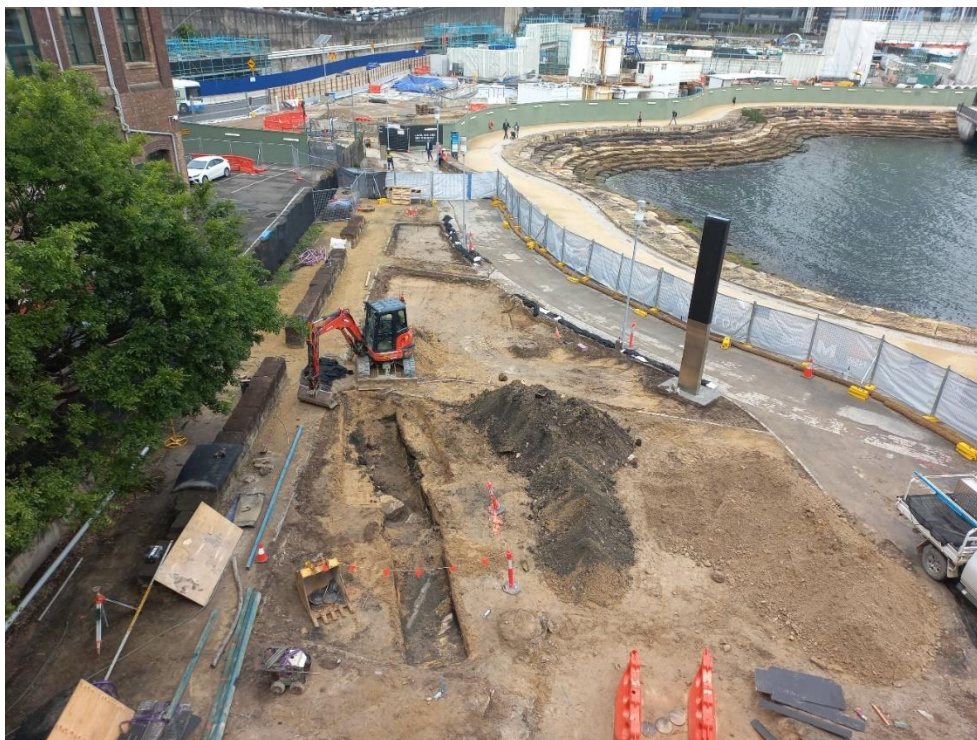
View from Munn Street Reserve looking south over trench 5.1.
